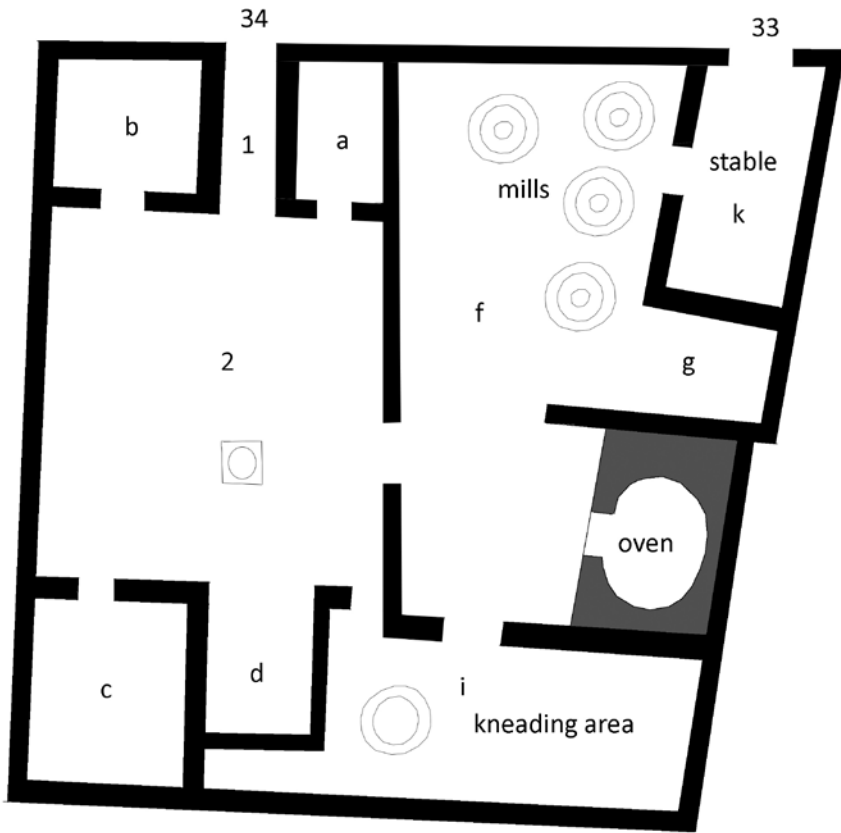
Pompeii, house VII 14, 33–34. Plan.
